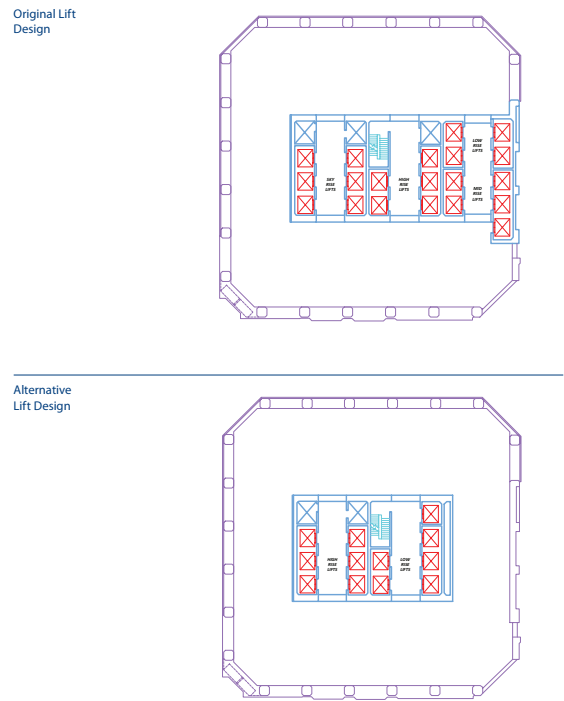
Rialto South Tower Elevator Core (Source: Meinhardt Pty Ltd)
